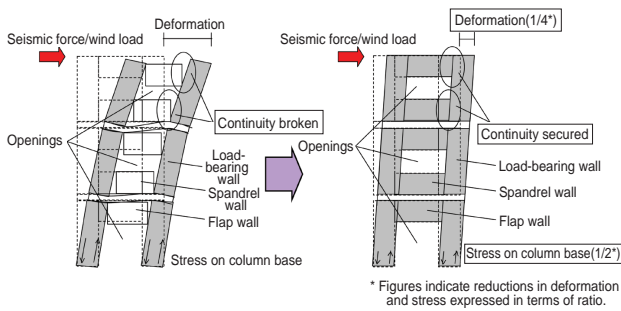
Bearing improvement system by spandrel walls and flap walls
